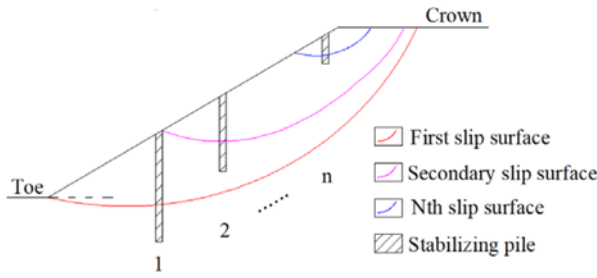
Sketch of Arrangement for Multi-Row Stabilizing Piles
